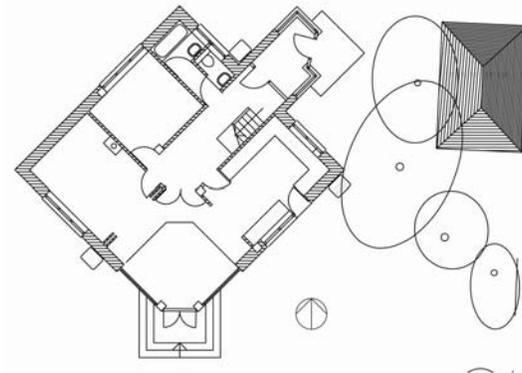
Site Plan and ground floor of exemplary dwelling, Architect James Deasley
